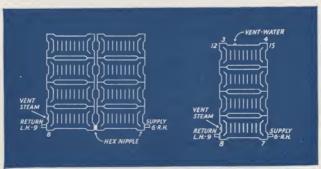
Assembled in two or more stacks. One and two pipe steam only. Bottom feed.
